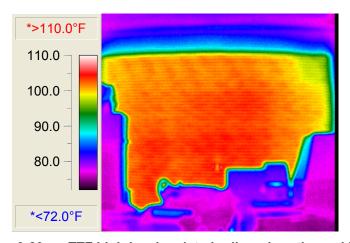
TTF high-bay insulated roll-up door thermal bridging
